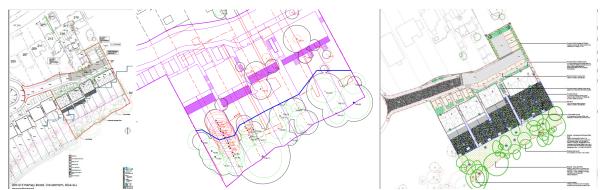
Permission 190887 approved layout, tree protection plan & landscaping details.
